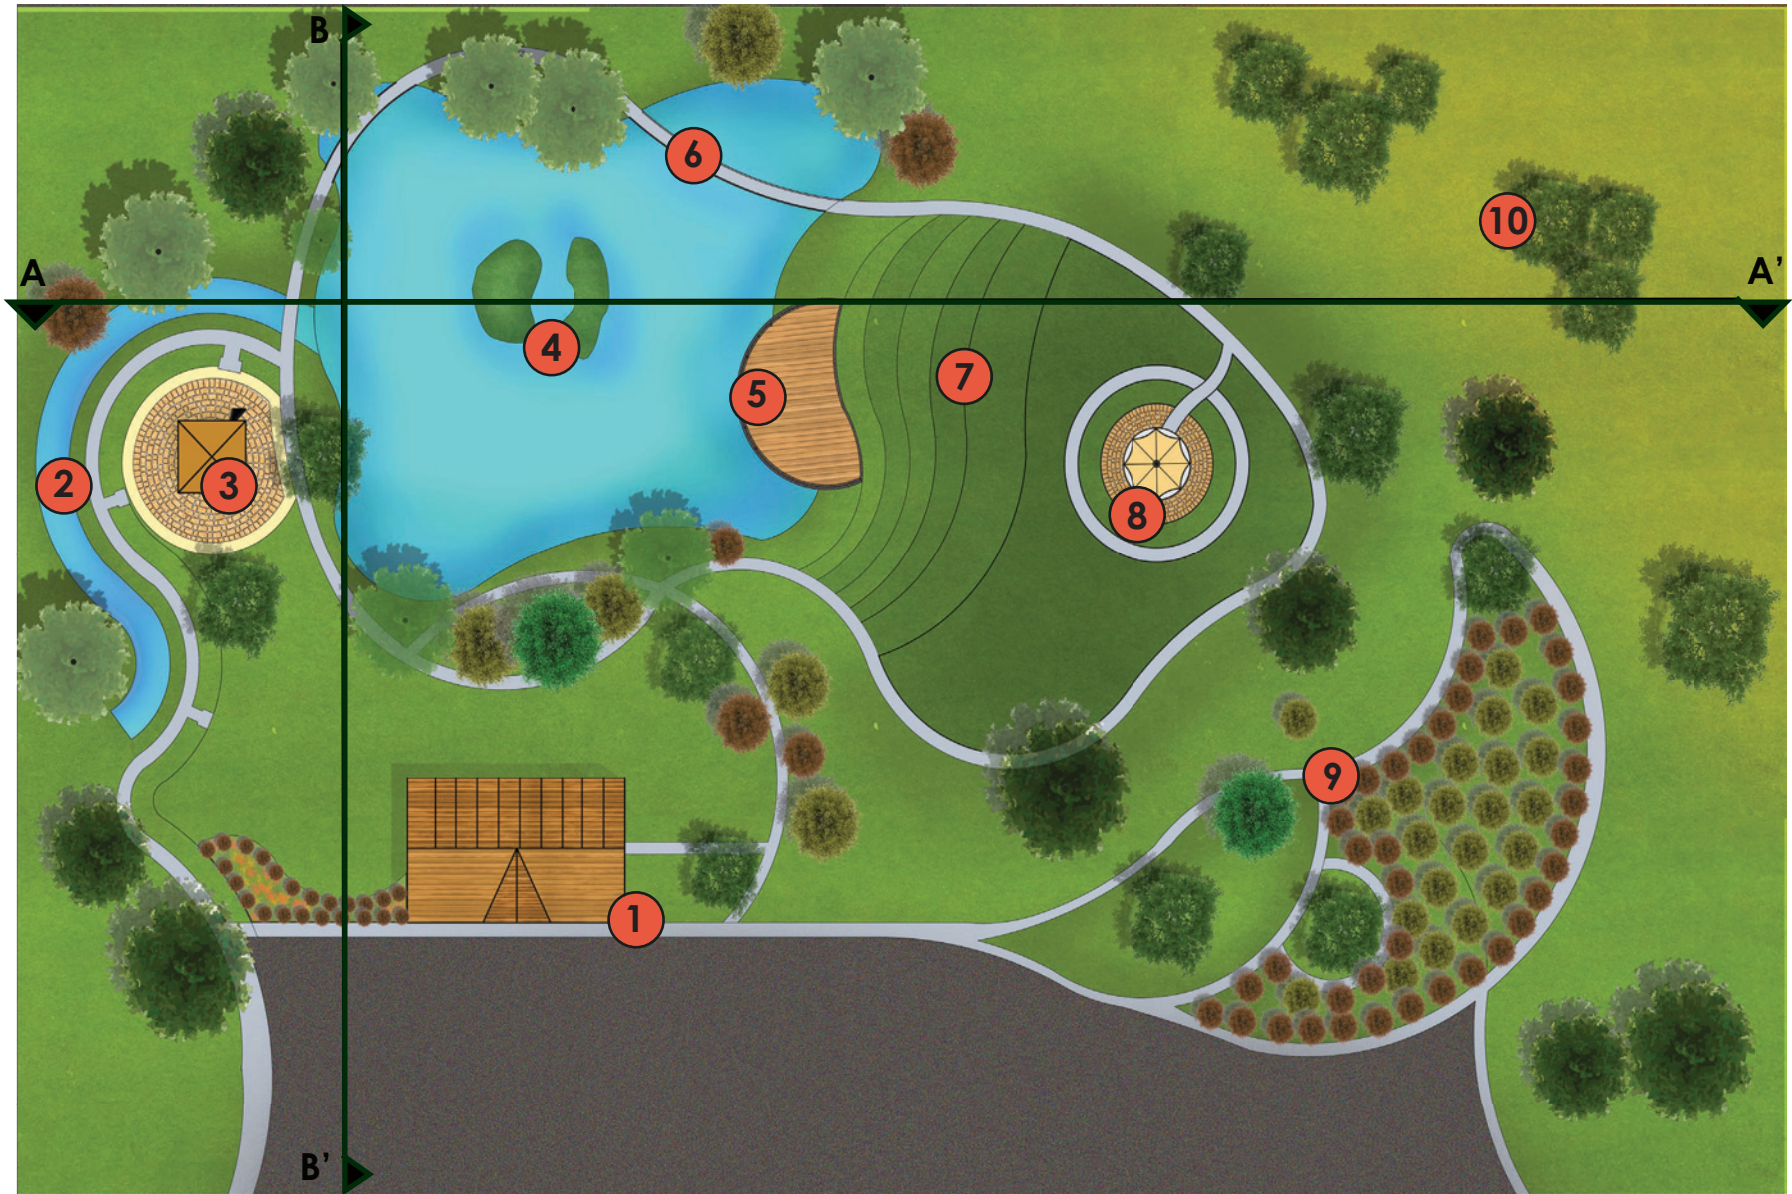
Masterplan shows the connection of the design elements on site.
